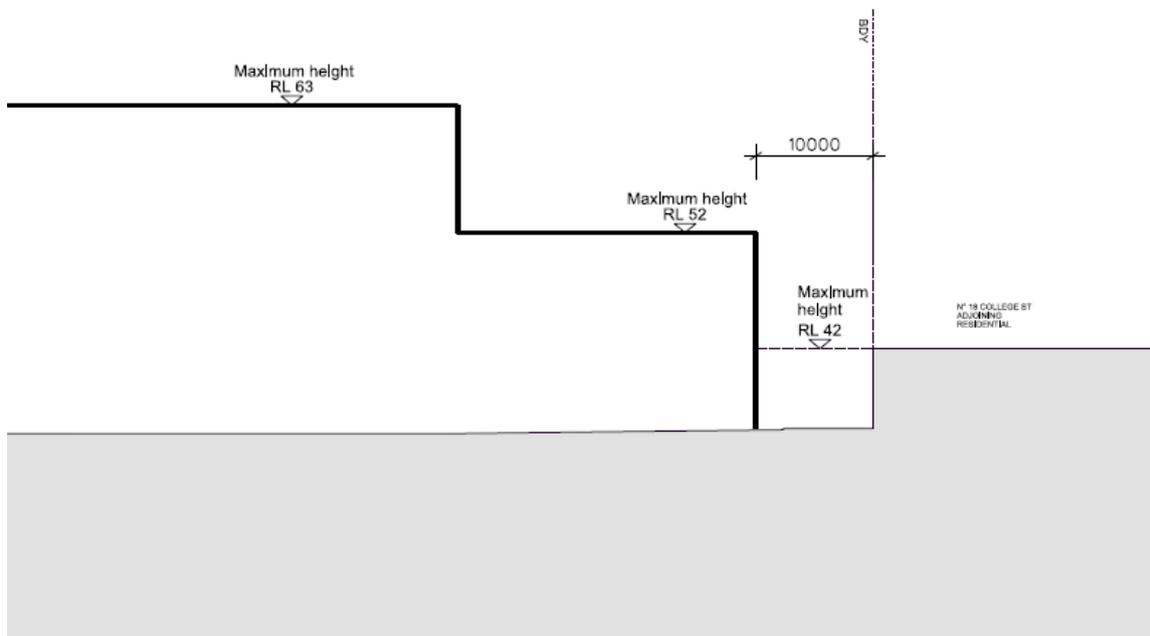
Section D Setbacks to neighbouring residential property at 18 College Street
